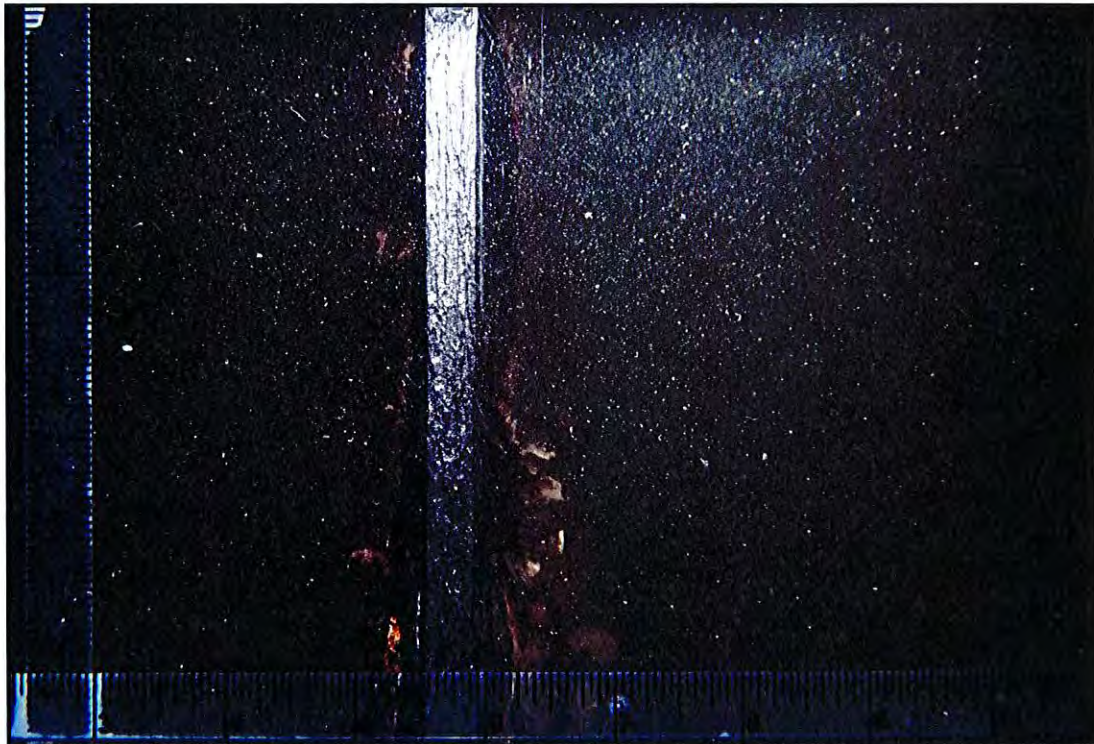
Typical condition of the flange edge of a H-pile graded Moderate. H-pile location at Bent T and Pile Row 21.
